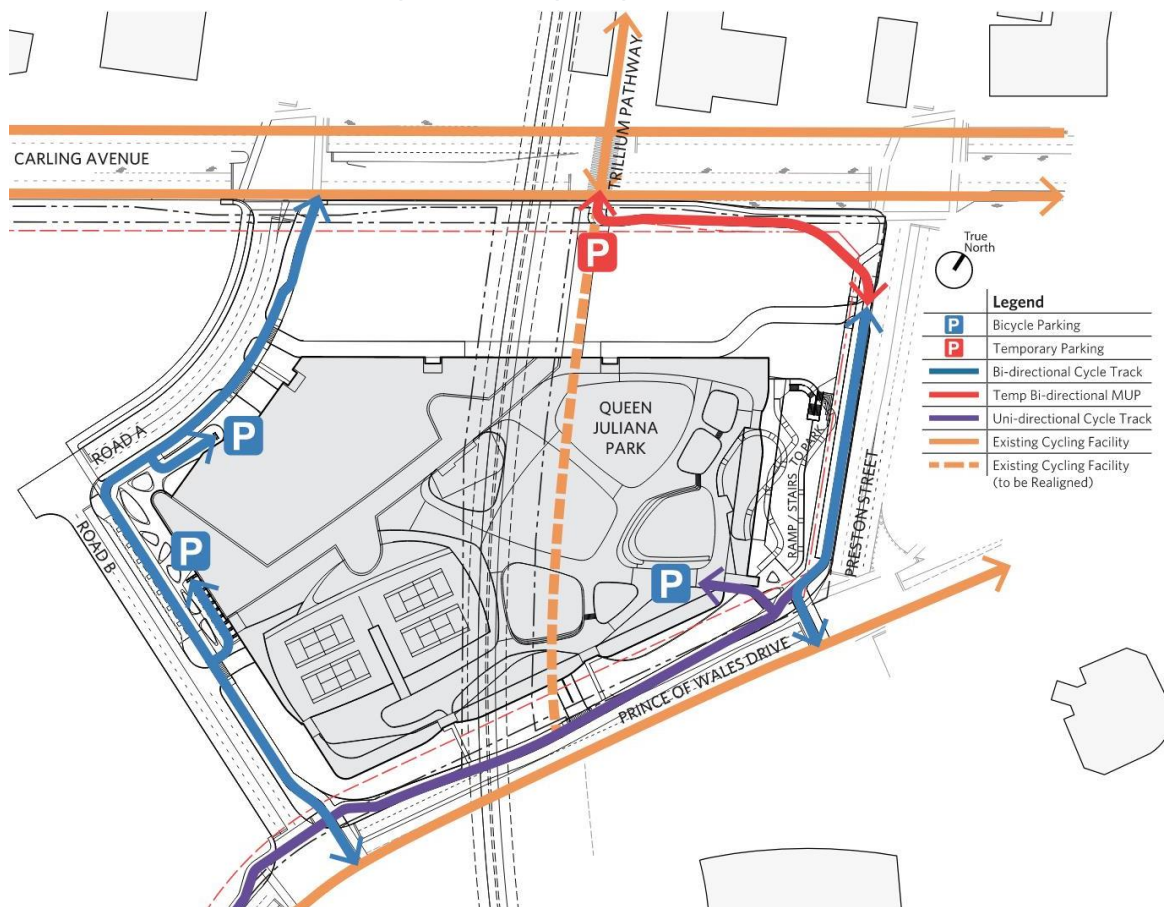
illustrates how the Parking Garage project will construct a temporary multi-use pathway from the existing crossing on Carling Avenue along the south side of Carling, connecting to a permanent bi-directional cycle track on the west side of Preston Street. This linkage amounts to a bypass of the Parking Garage Site for through bicycle traffic on the Trillium Path.
